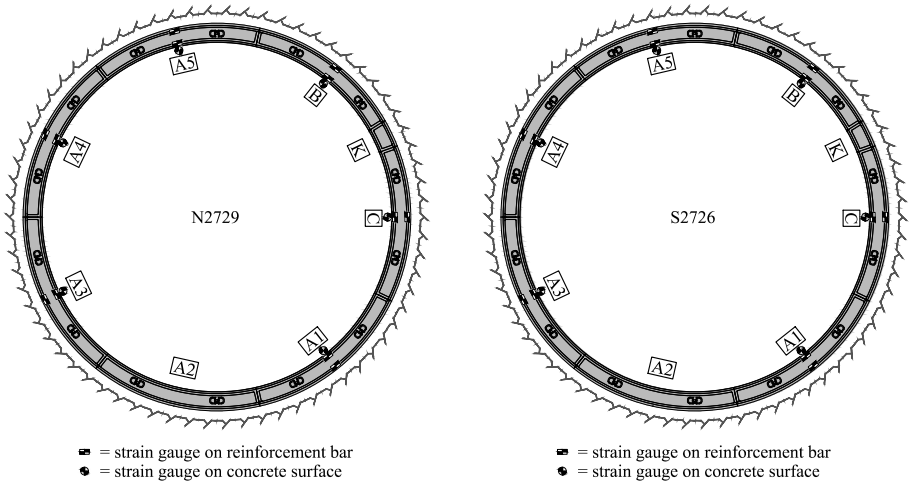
Segment orientation in tunnel sections N2729 and S2726.
